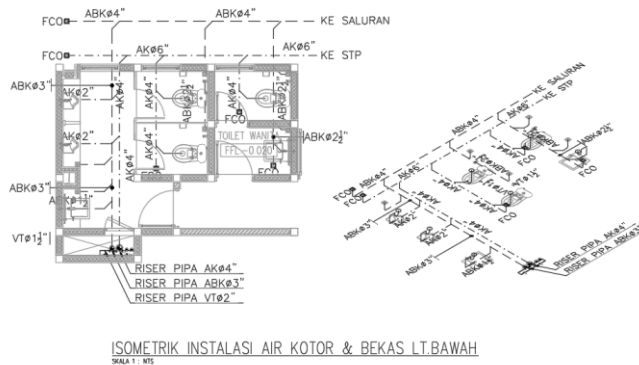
First Floor Waste Water Pipe Line Installation Plan
